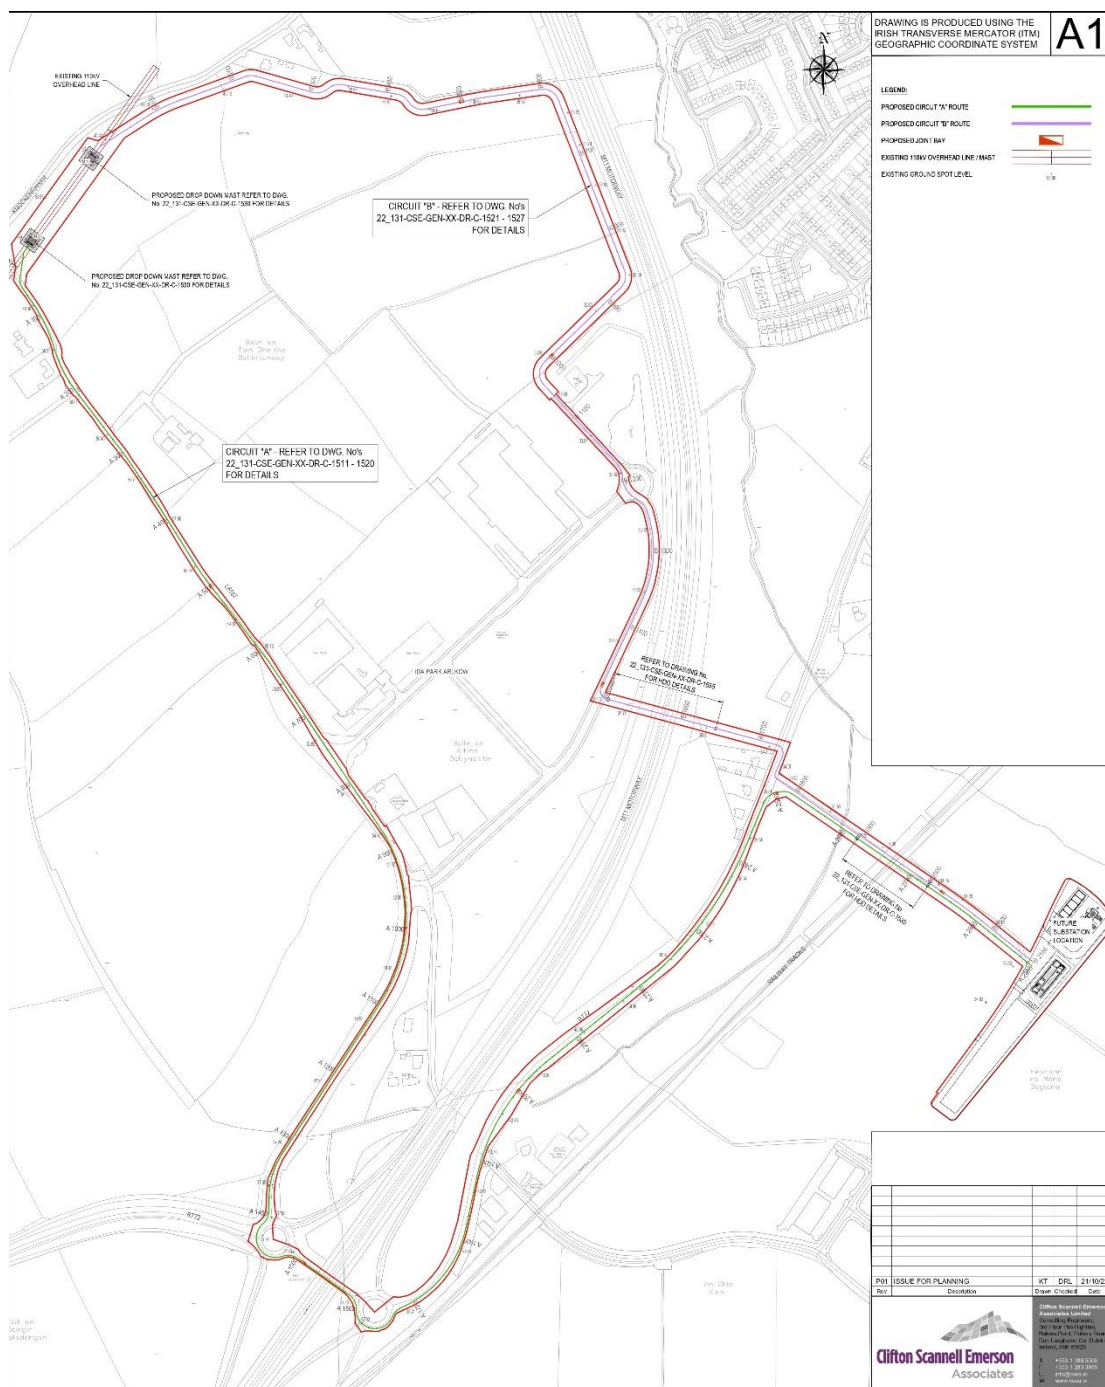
Cable Circuit Site Layout (CSEA: 122_131-CSE-GEN-XX-DR-C-1510)
